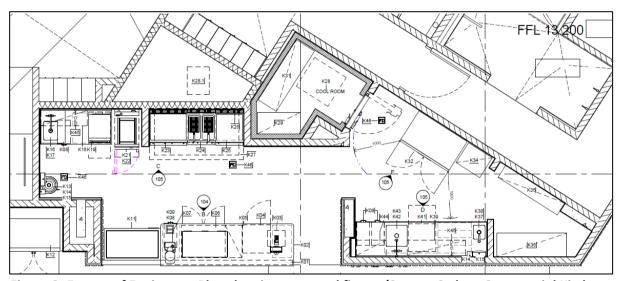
Extract of Equipment Plan showing proposed fit-out (Source: Sydney Commercial Kitchens, 2024)
